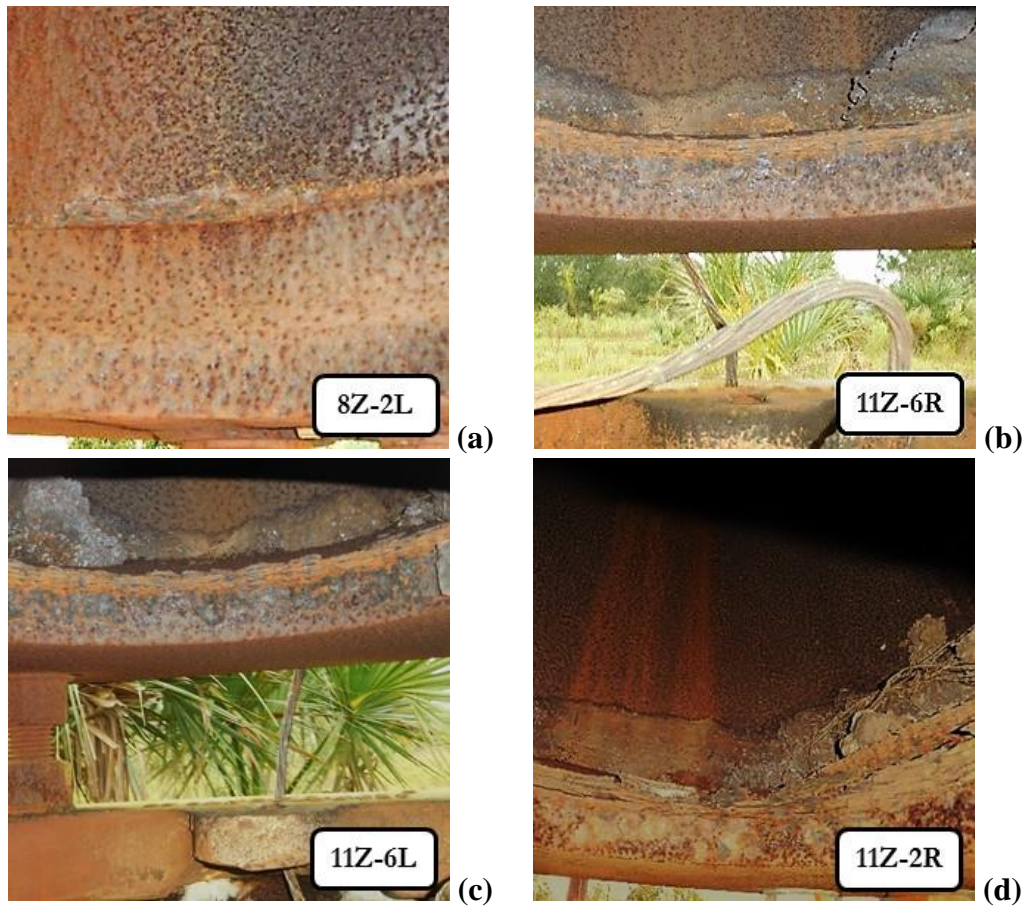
Corrosion damage on interior of unsealed WS poles at Site 5: (a) dense pitting on Pole 8Z-2L; (b) pitting and pack rust on Pole 11Z-6R; (c) pitting and pack rust on Pole 11Z-6L; and (d) severe pack rust on Pole 11Z-2R.
